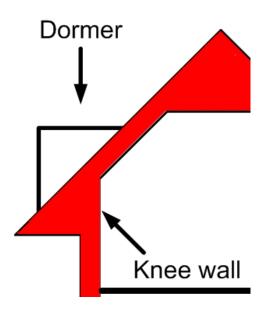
The Red Area Denotes the Void Space Present with Knee Walls
